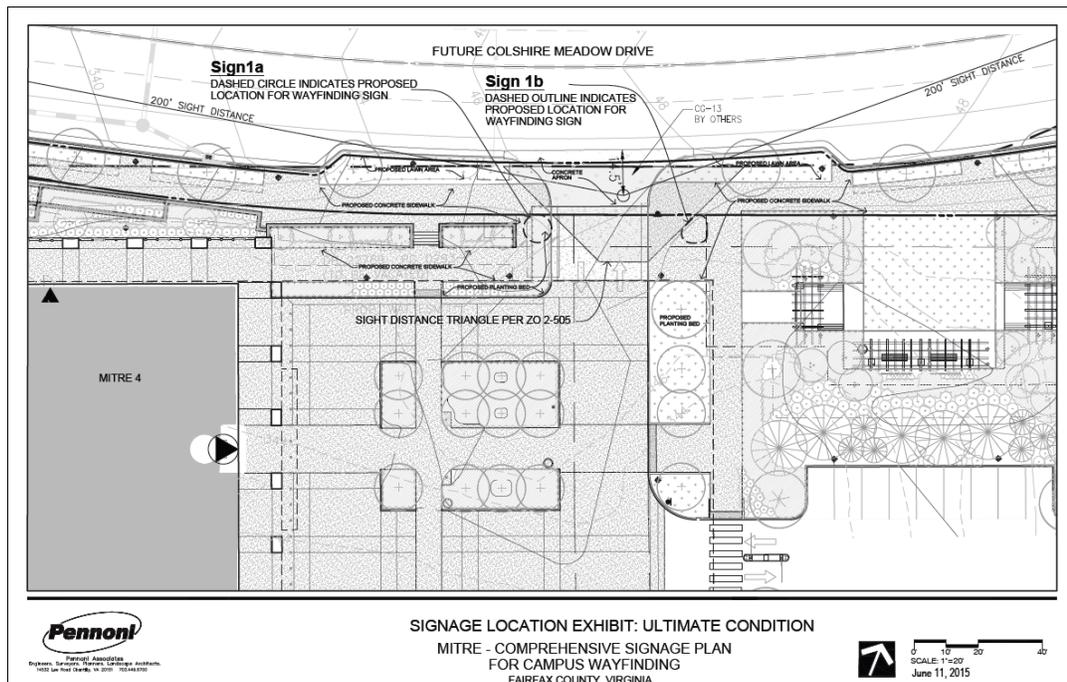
EXHIBIT showing future road grid, sight distances and alternative locations for Sign 1
